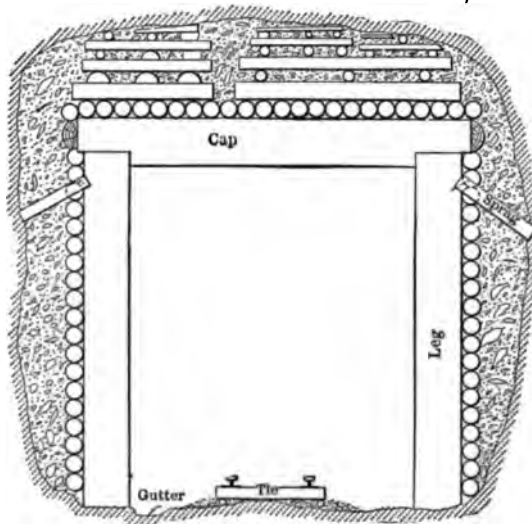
END VIEW OF DRIFT SET, SECTION 16 MINE.
